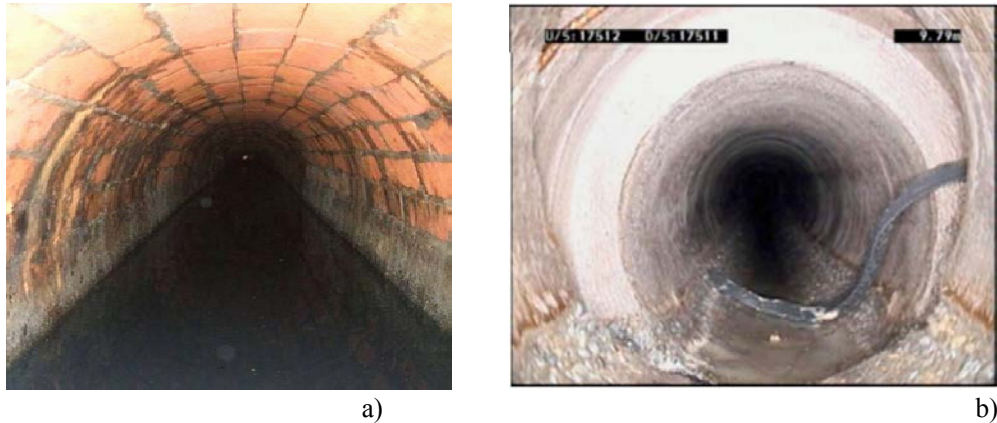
Example of pipe failures after the Canterbury earthquakes: a) brick barrels concrete “egg” crack and silt ingress; b) reinforced concrete pipe joint failure with rubber ring exposed (*photo credit: SCIRT, used with permission*).
